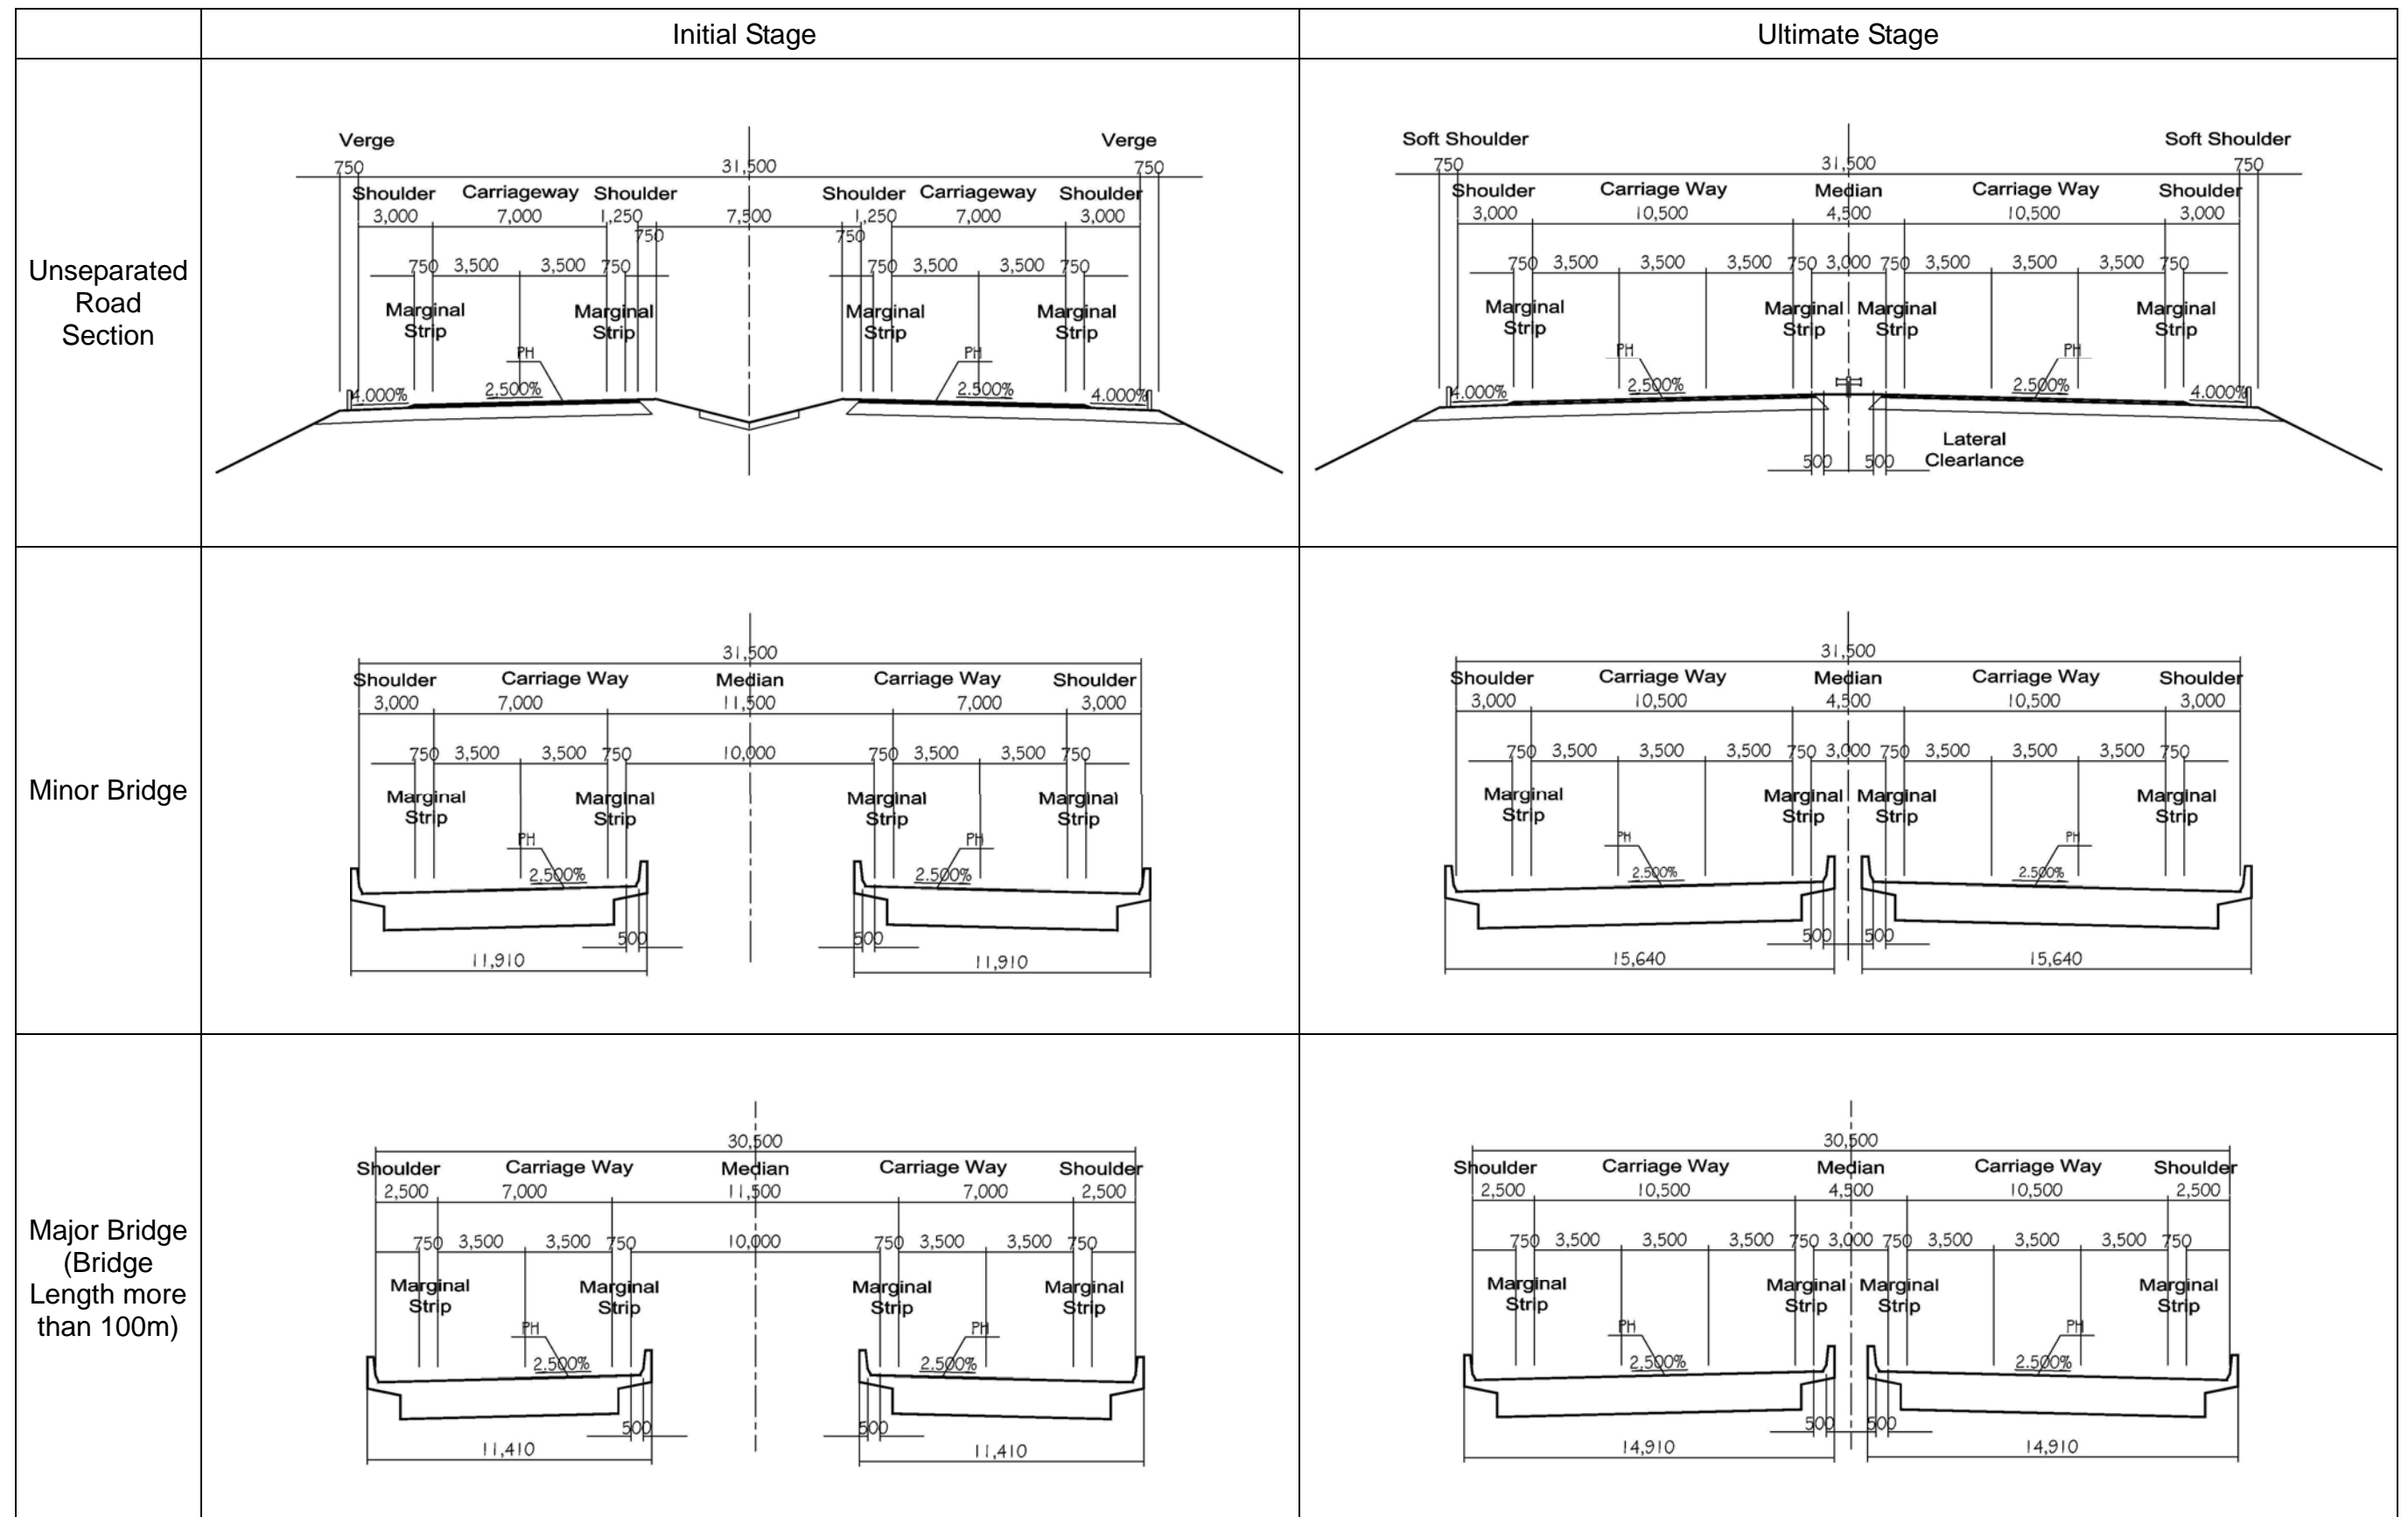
Typical Cross Section of Outer Circular Highway (2)
